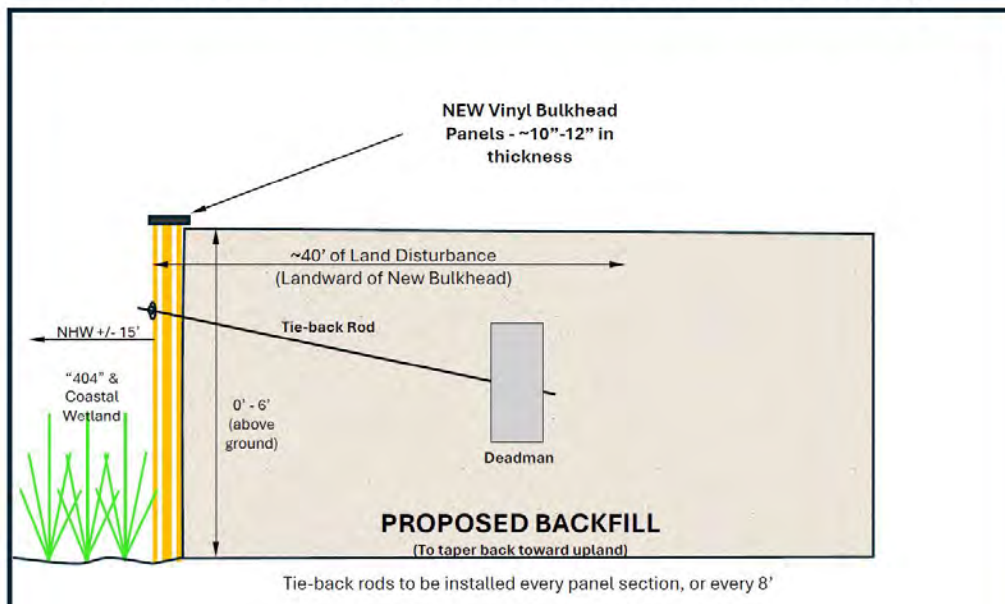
Bulkhead Cross Section Detail (provided by the applicant)
